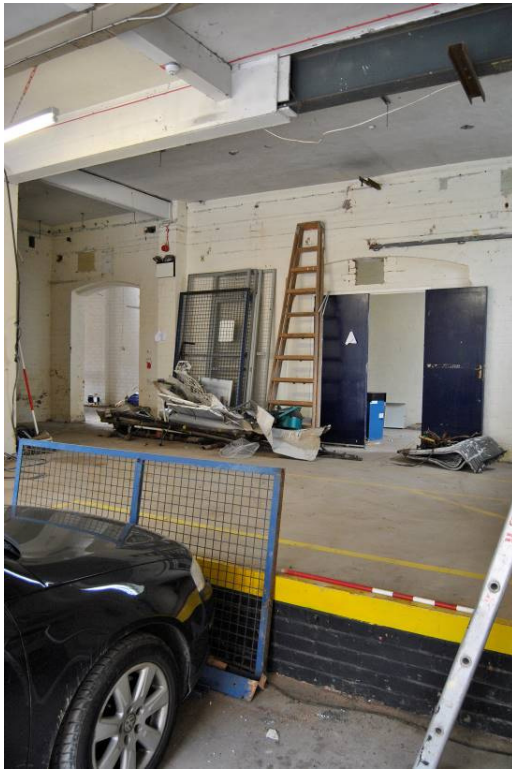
Raised platform created by reduction of floor level to north side of Bays 5/6.
